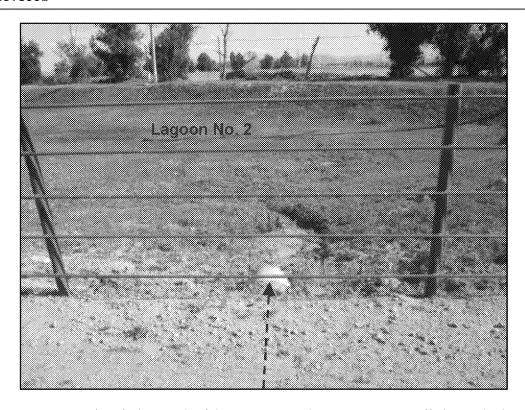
View facing south of the PVC pipe outlet from disposal field No. 2, shown in Photograph 15, into lagoon No. 2.
